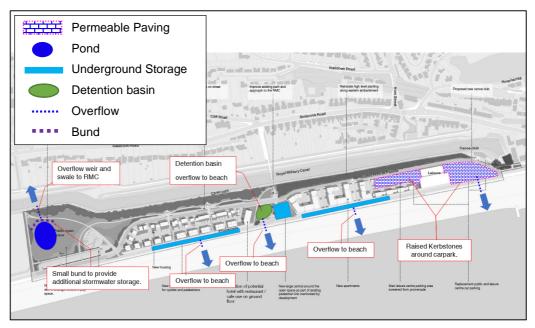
Plan showing proposed SuDS and overflow control systems.
